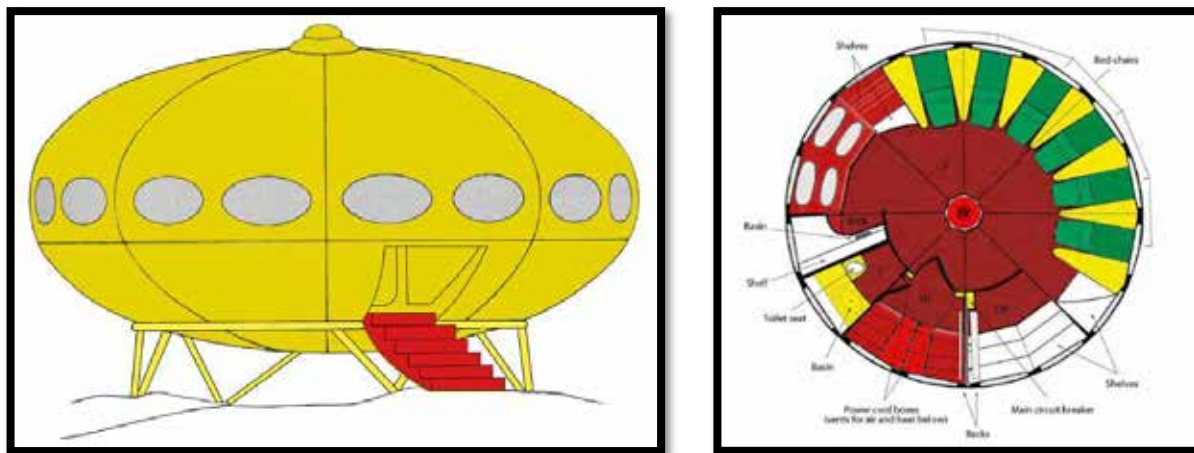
Drawings of Futuro house no. 001.¹²⁶ Left. Exterior elevation plan. Right. Interior plans.
